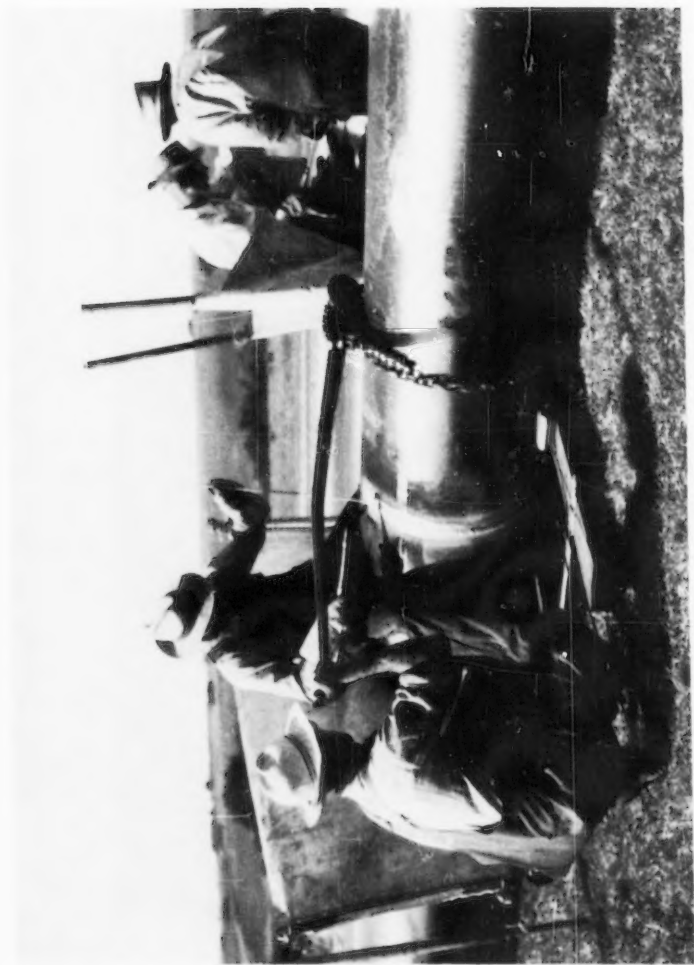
Acetylene welding. Note arrangement for rotating pipe.
